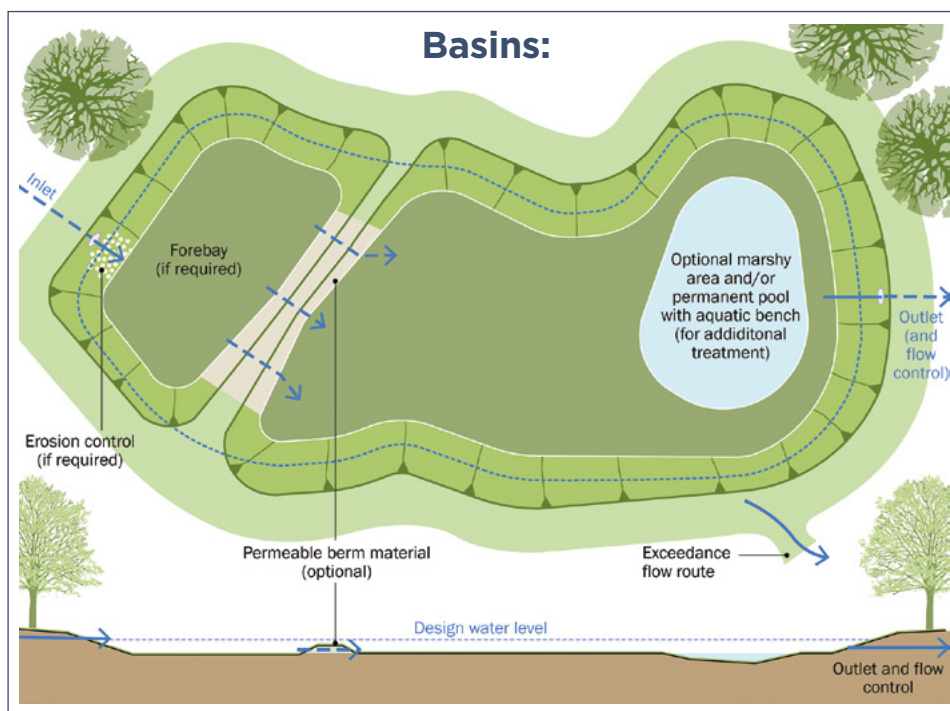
Plan & elevation of basin CIRIA C753 p.474
